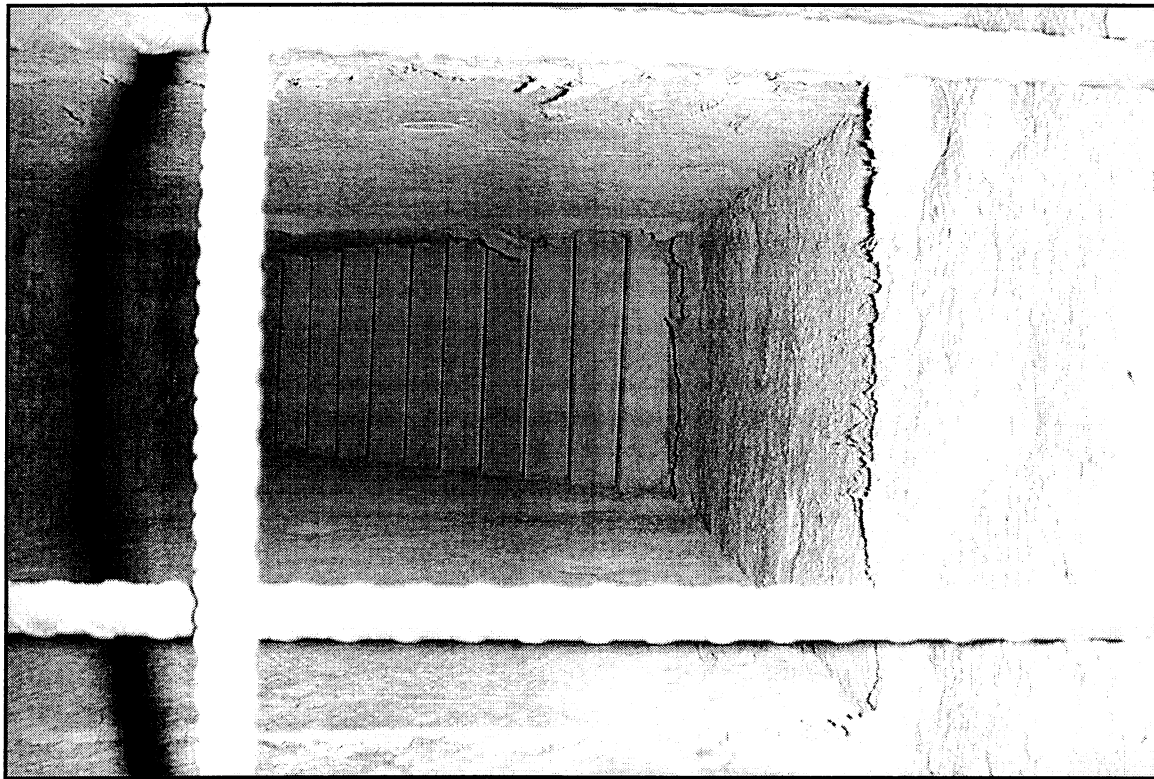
Control Room Ventilation System Outside Air Intake for ONS Units 1 and 2. Turning Vane at 52 in. down into duct.
